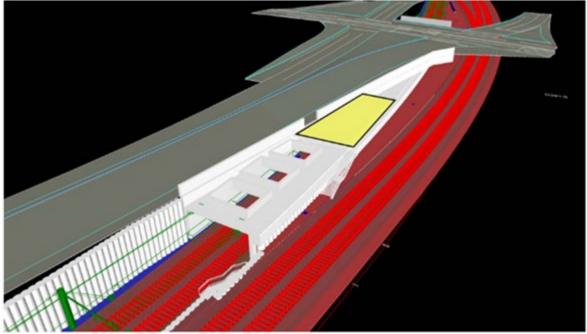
South Circular Road (OBC1A) – Track Access Maintenance Parking Area (Shaded in Yellow)
